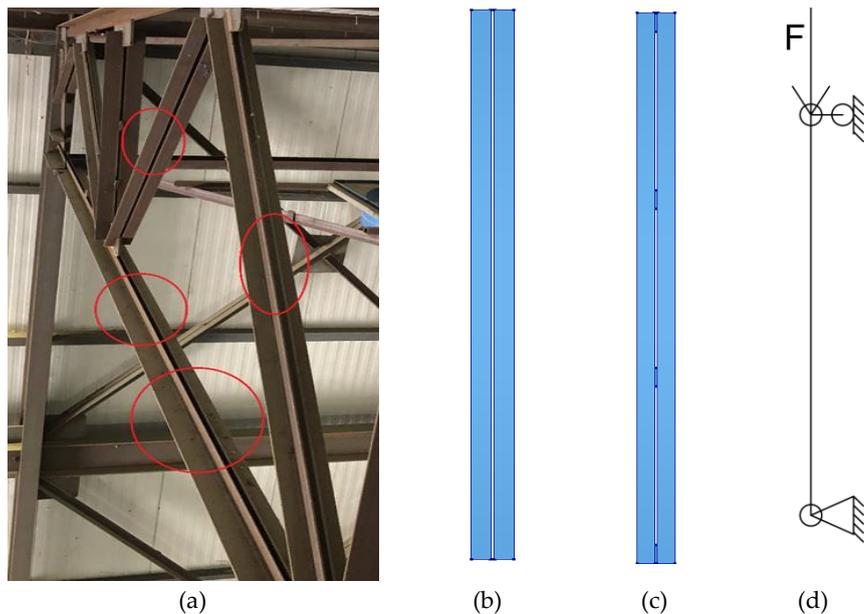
Compressed truss elements: (a) actual condition on site, (b) without gusset plate, (c) with gusset plate and (d) analysis scheme
